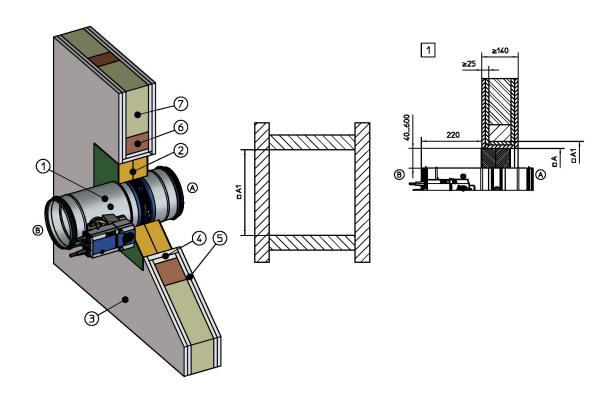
Dry mortarless installation into a lightweight partition wall with timber support structure, use of a fire batt
